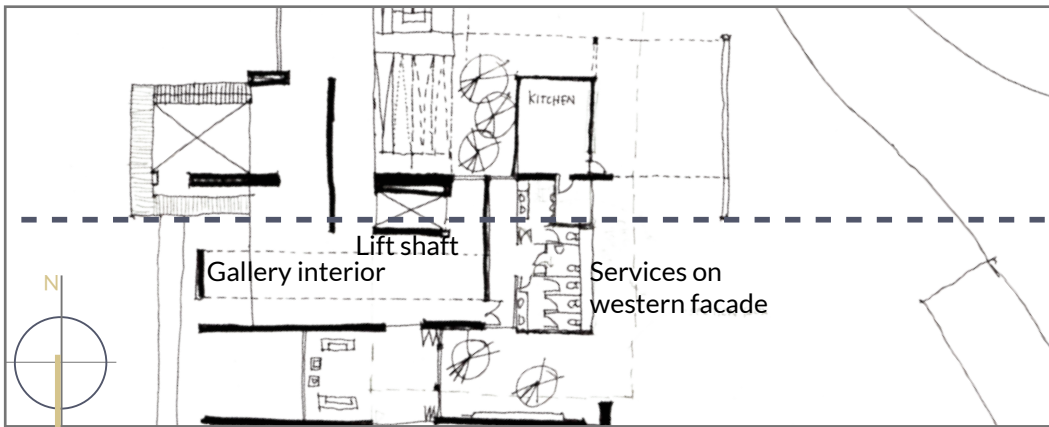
Section shown in figure 32 indicated on conceptual floor plan
